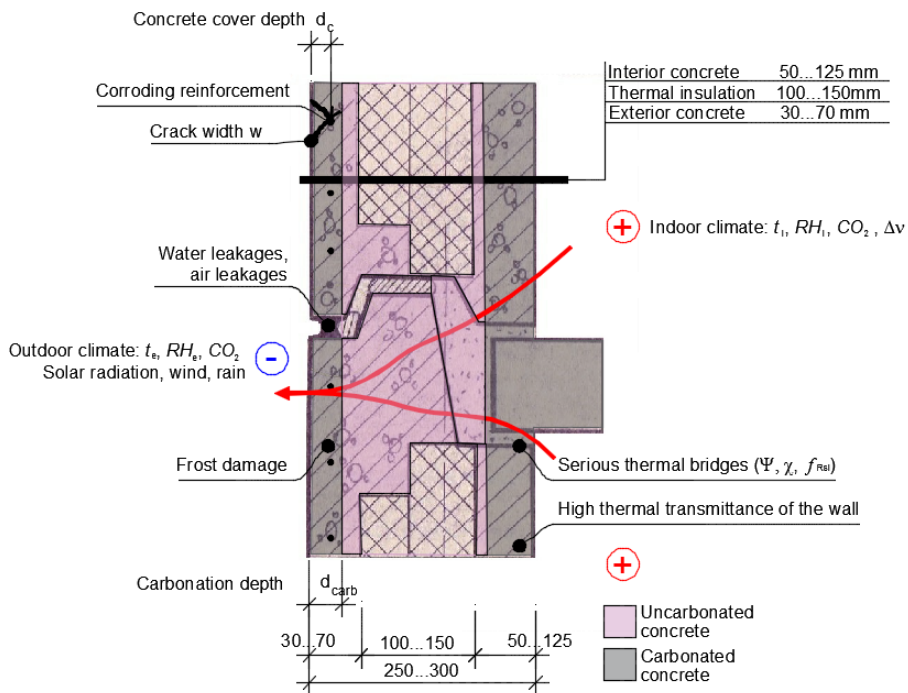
Vertical cross-section of a junction of two external wall large-panels and inserted floor slab of RC apartment building with the main damage and indoor and outdoor hygrothermal loads. In the pink areas the pH of the concrete is alkaline; grey shows areas where carbon dioxide has penetrated into the concrete causing carbonation.
